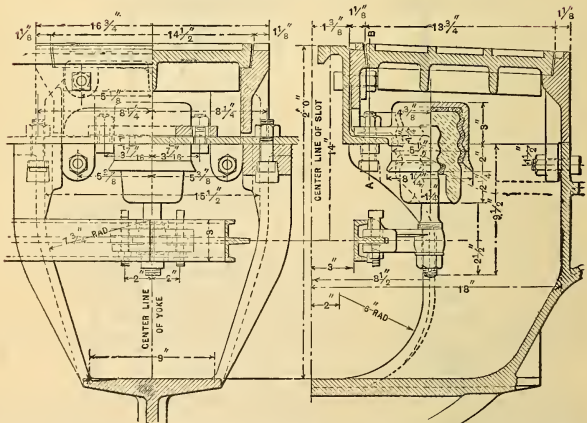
Section and Elevation of Insulator, Metropolitan Street Railway, New York. — Standard Work, 1897-98.
